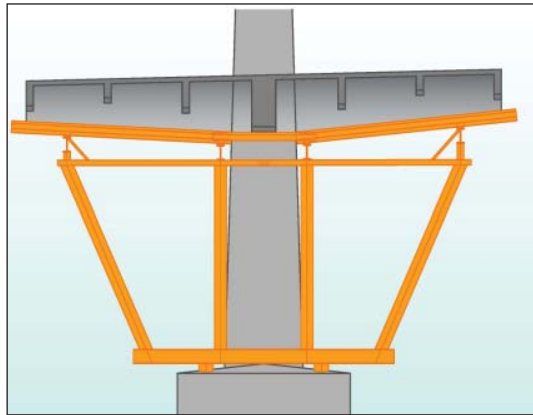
Falsework (orange) is a temporary structure used to support the bottom deck forms.
